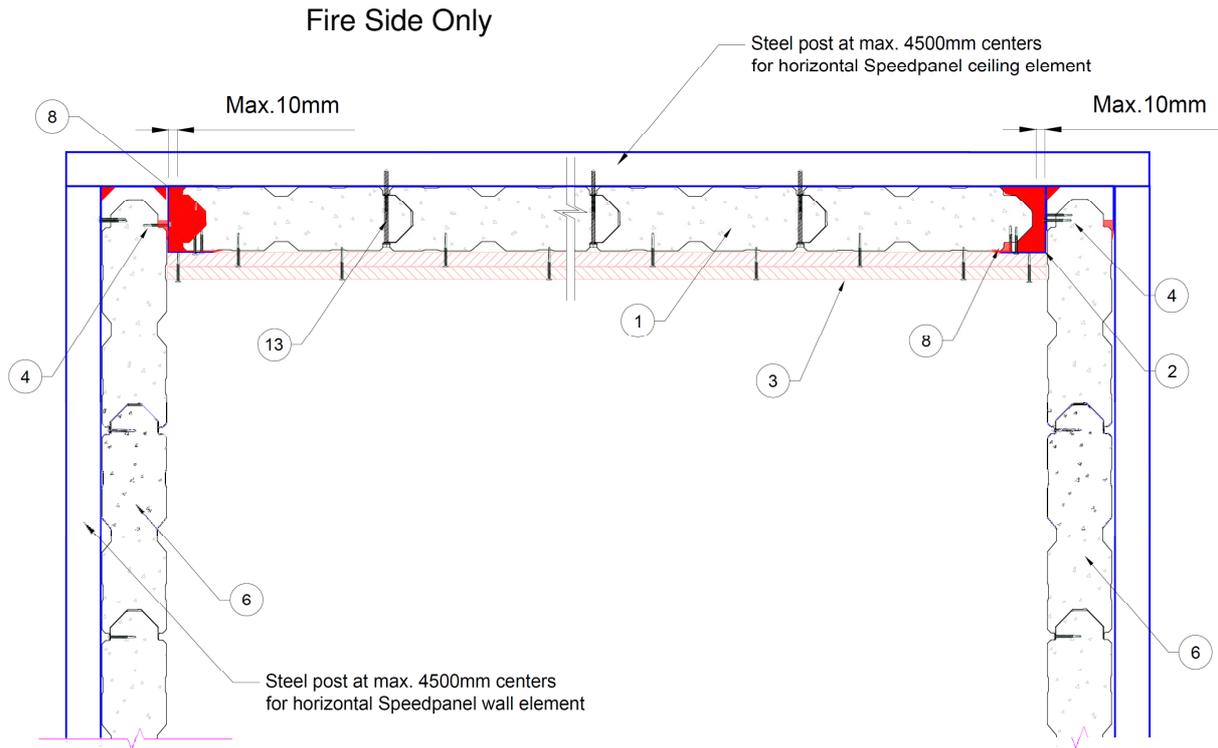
Speedpanel ceiling protected with plasterboard linings (Cross Section View)
